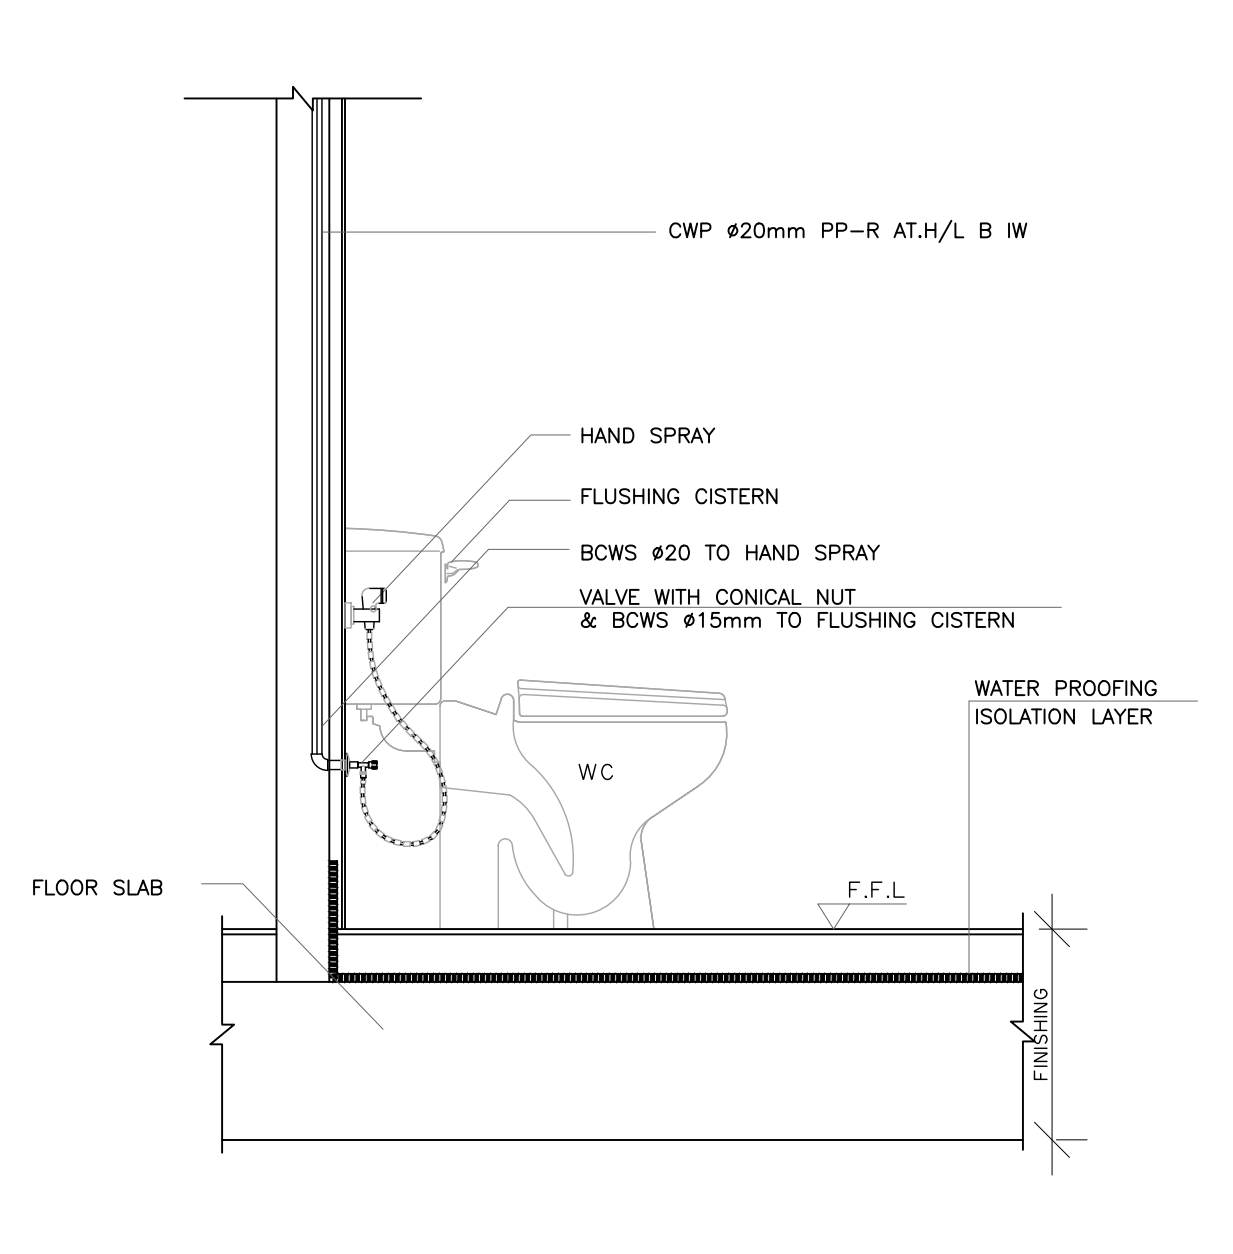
WATER CLOSET PIPING INSTALLATION DETAIL
